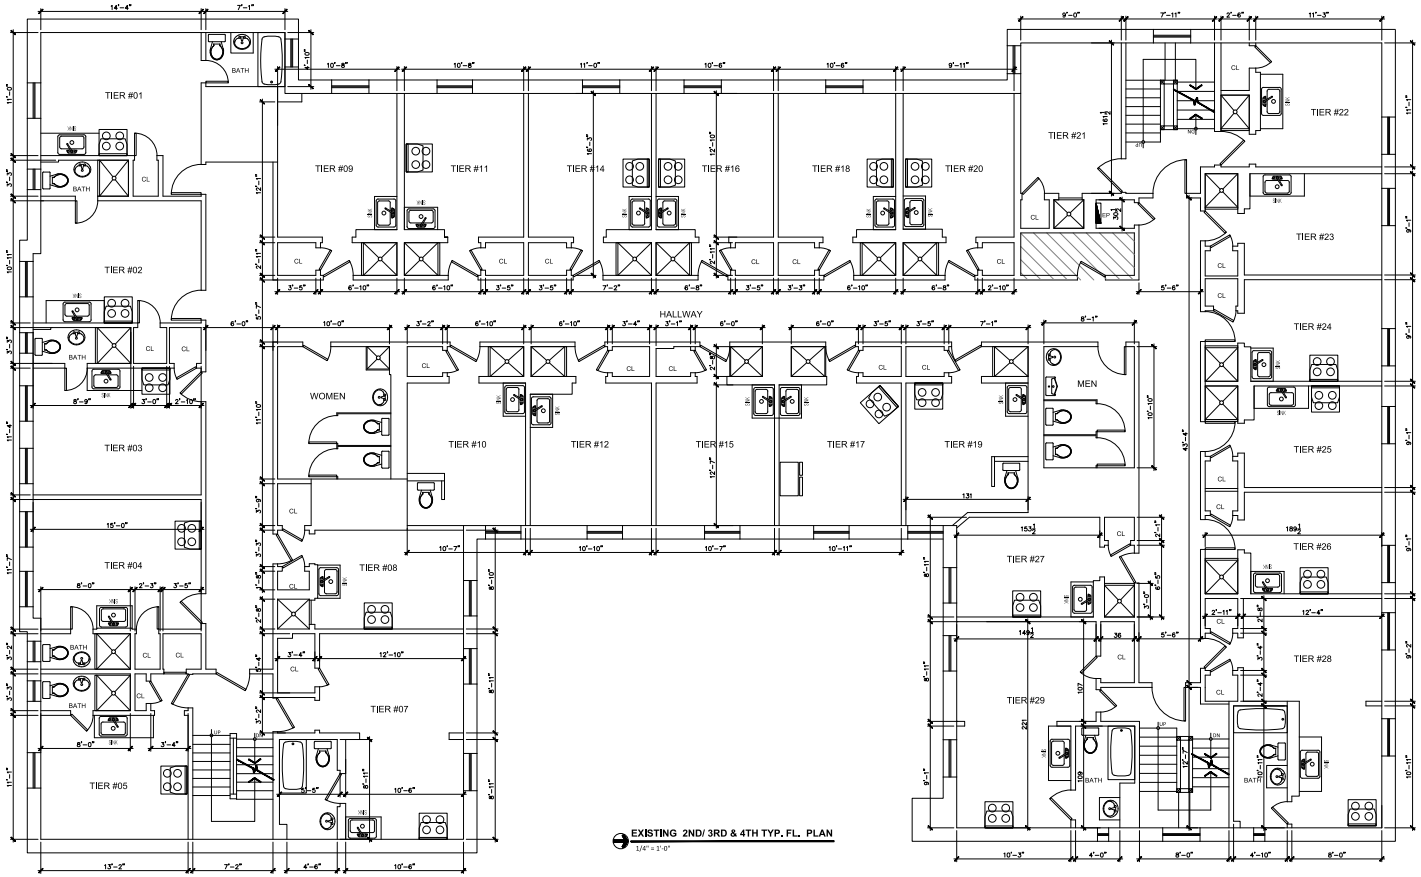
Royalton Hotel – Typical current 2nd - 4th floor plan
